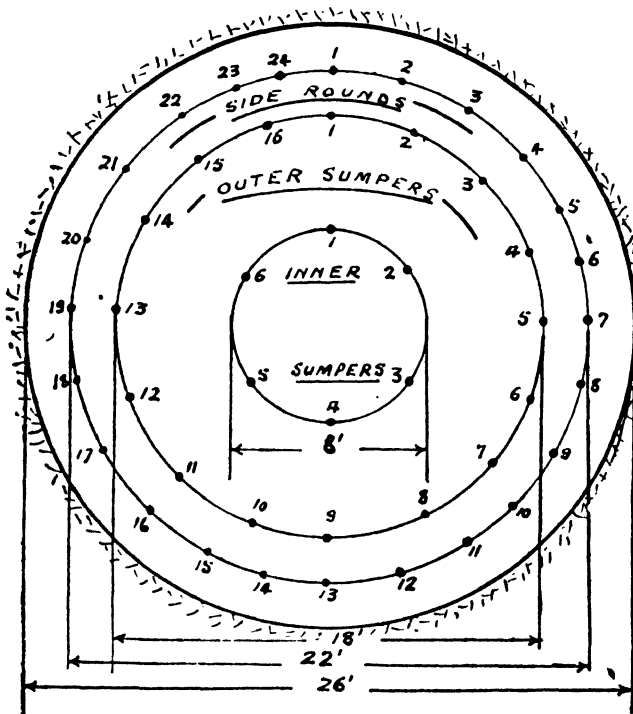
Plan View of Shot-holes for a Sinking Pit.
